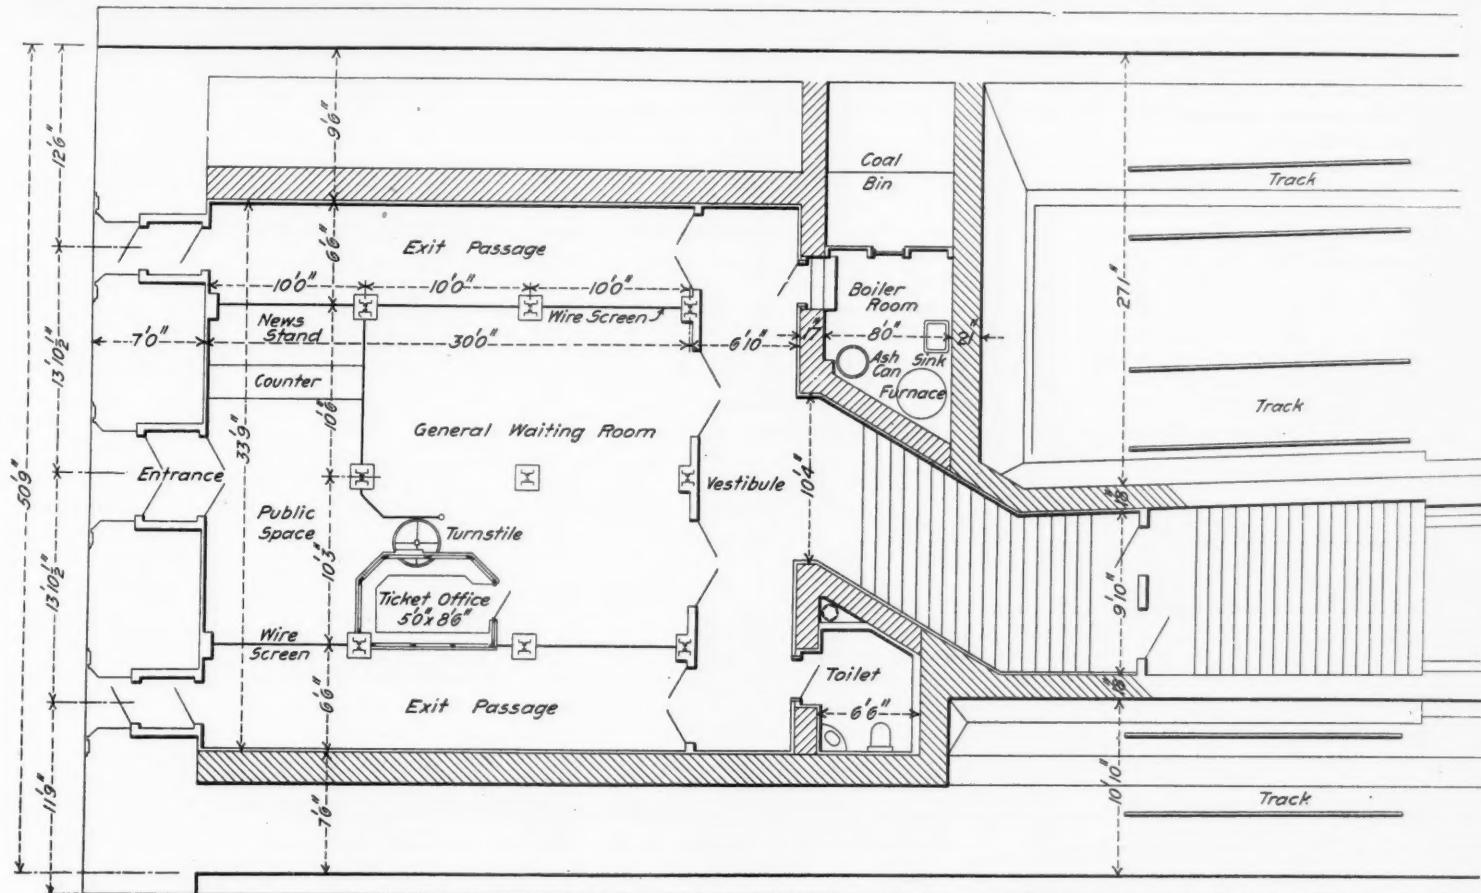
Details of Typical Elevated Railroad Station; Chicago Junction Railway.
